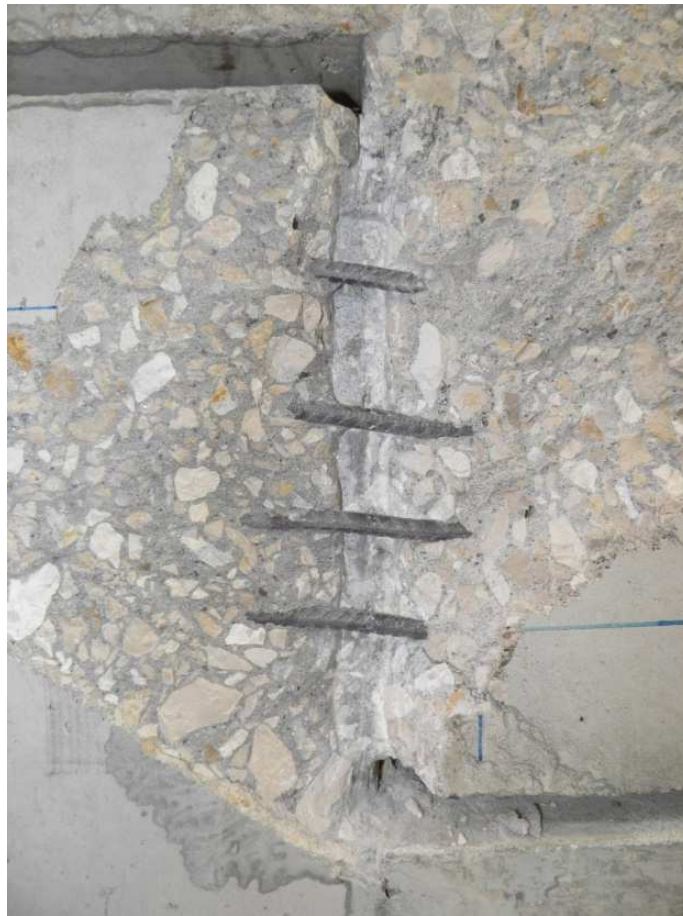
Outlook (after the surrounding concrete removal) of the reinforcement crossing an interface subjected to a high amplitude cyclic loading, at the end of the test.
